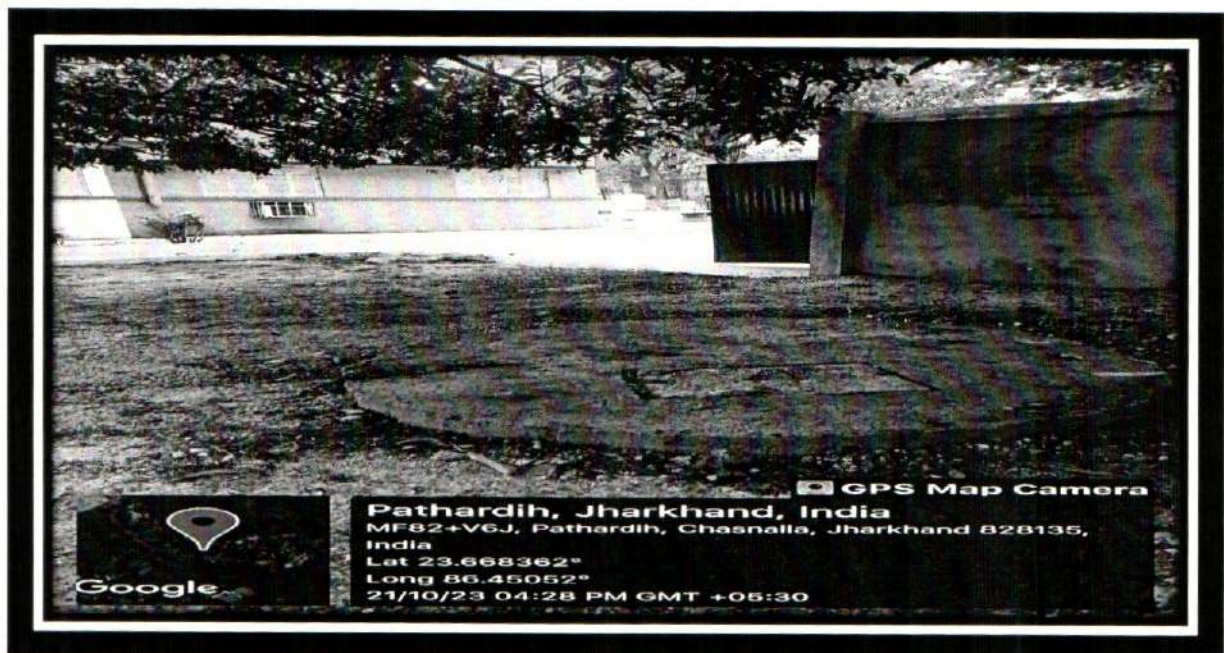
Roof top rain harvesting at Chasnalla Coal Complex
